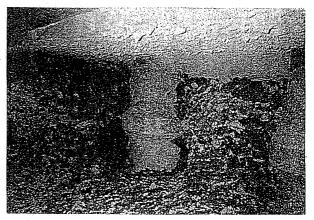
Examples of Damage to Pile Foundation due to Cracking of the Ground
